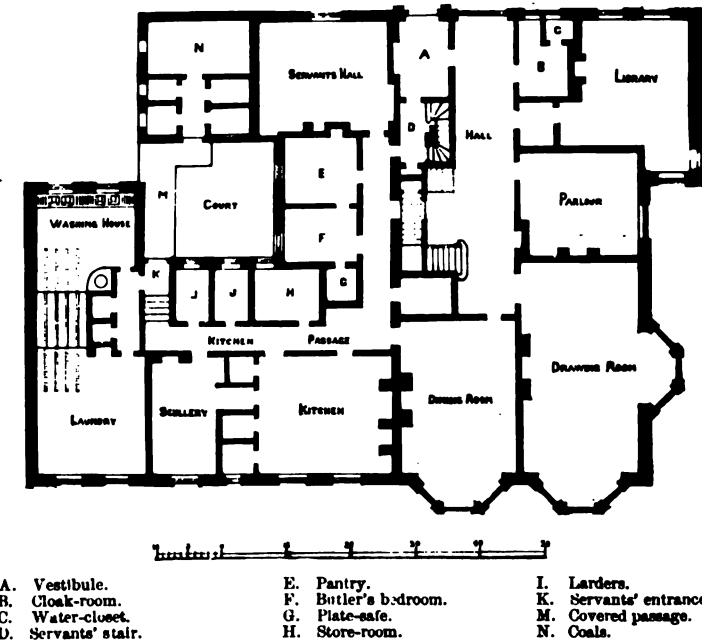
HOUSE AT WESTOE.—PLAN OF GROUND-FLOOR.
